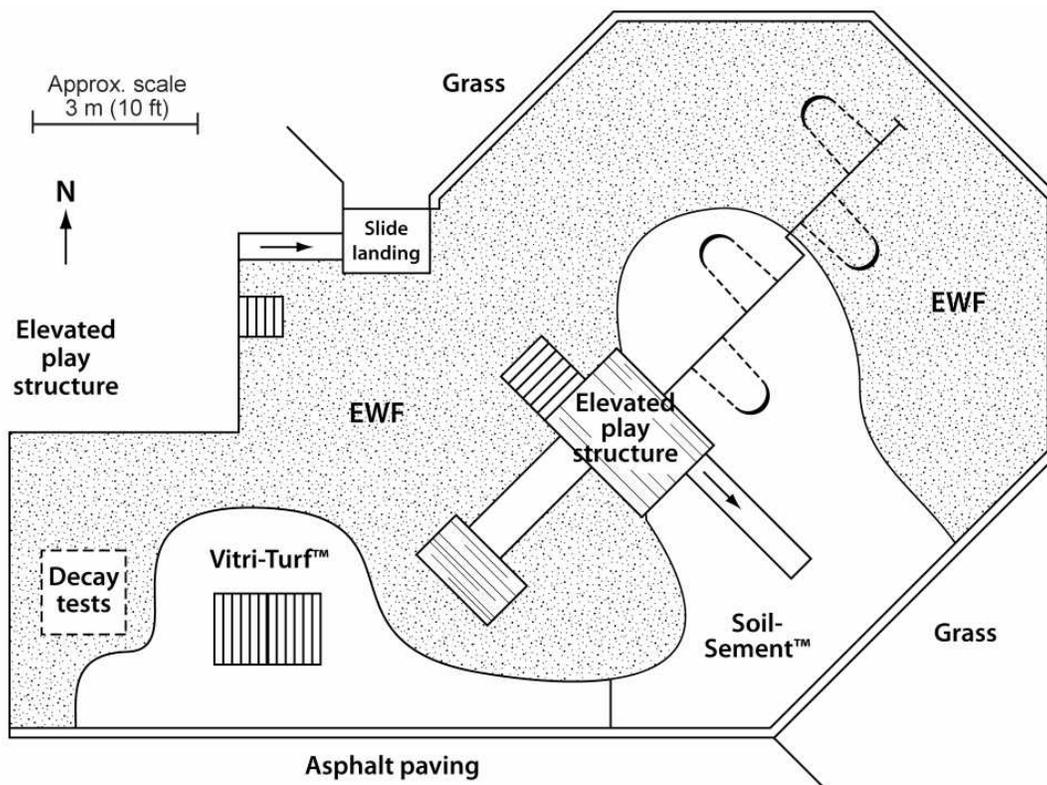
Schematic plan of playground site at Governor Nelson State Park.
